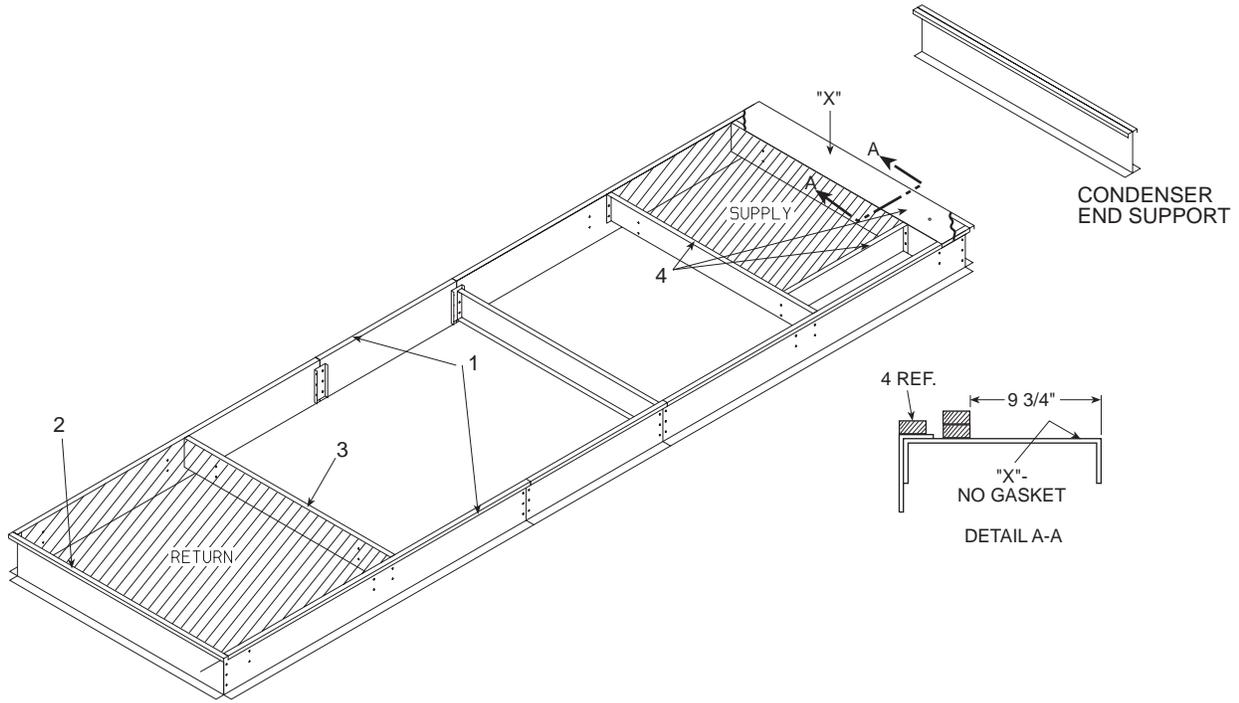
Gasket Location on Roof Curb (48ZG,ZN055-105 and 48Z6,Z8075-105 Units)
